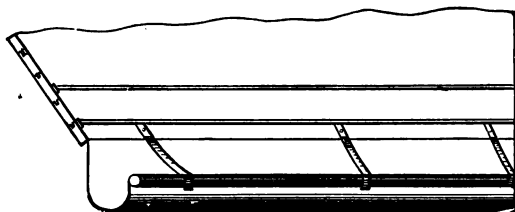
Perspective View of Gutter Shown in Fig. 9.
